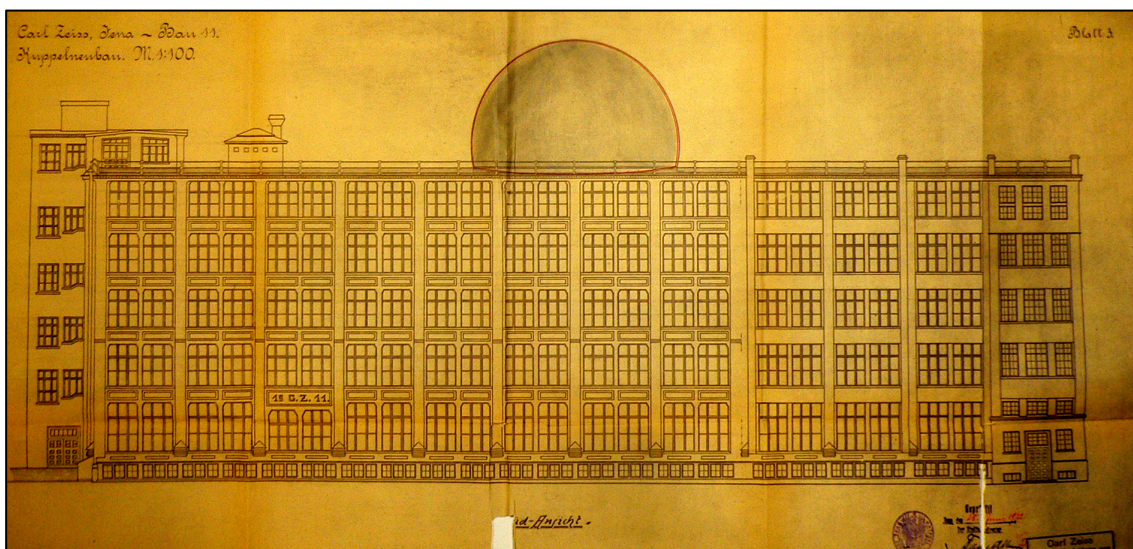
Elevation of the factory in which the first Zeiss dome was built.
